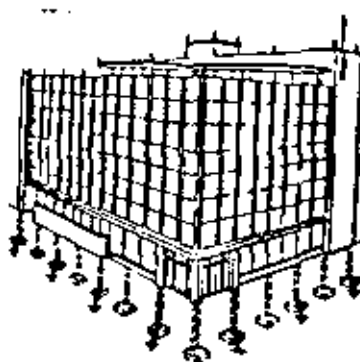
Steel building: Steel framing in tall buildings should be connected to air terminals. This type of structure requires special lightning protection.
